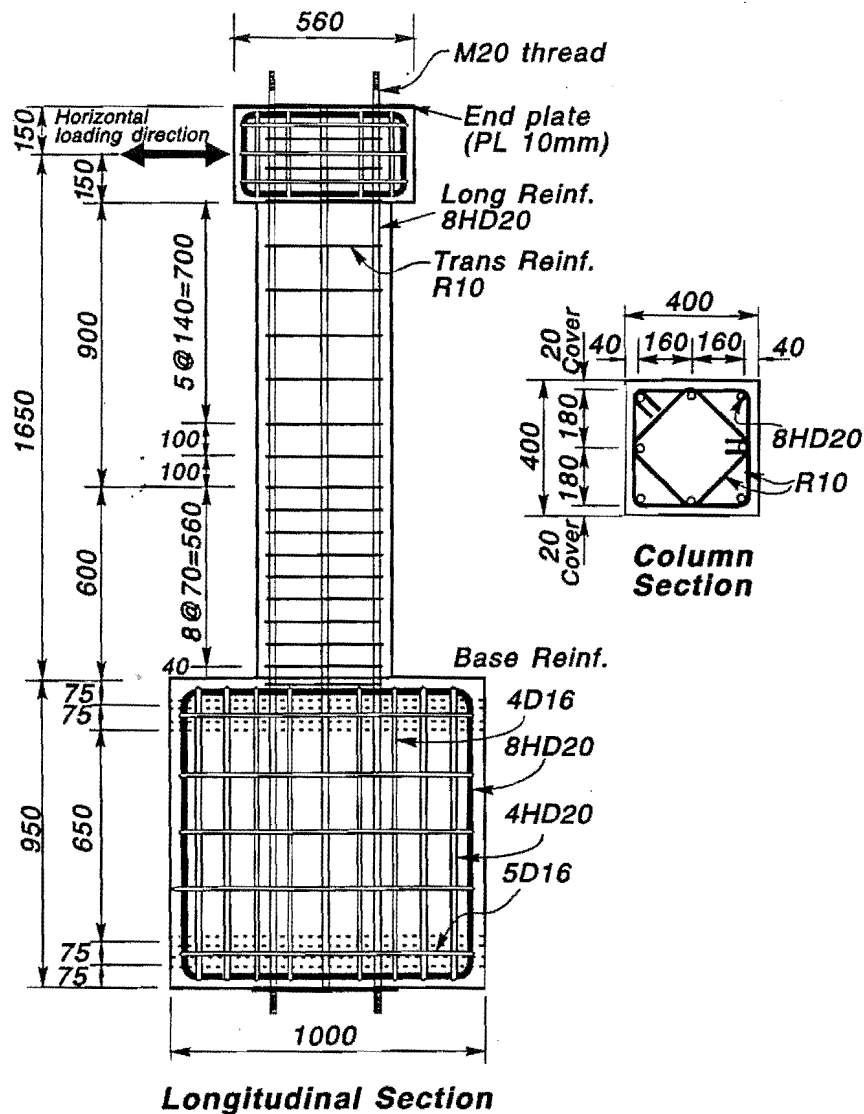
Details of reinforcement of Units 1, 2 and 3
